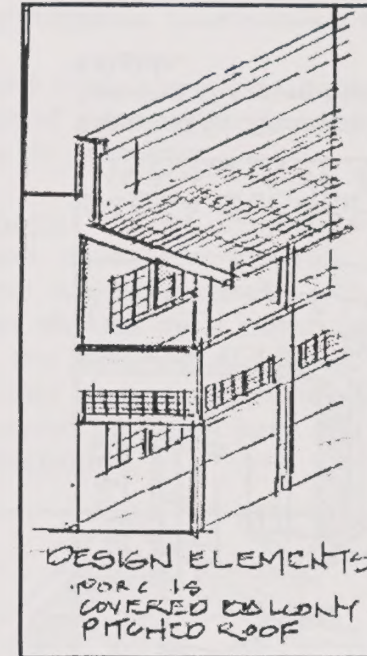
Conceptual sketch of historic architectural features which provide interest to building facades.
